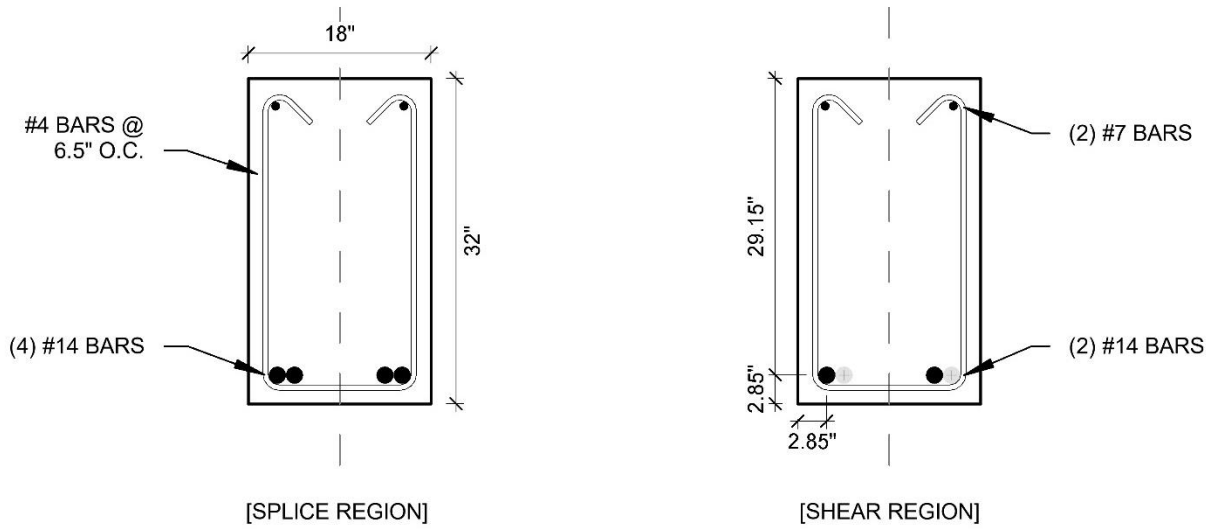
Cross section of 14-b (1 in. = 25.4 mm)
